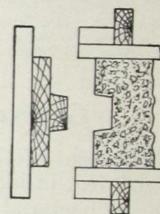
Method of joining foundation walls where it is necessary to leave an expansion joint, or where concreting has been discontinued for any reason.
